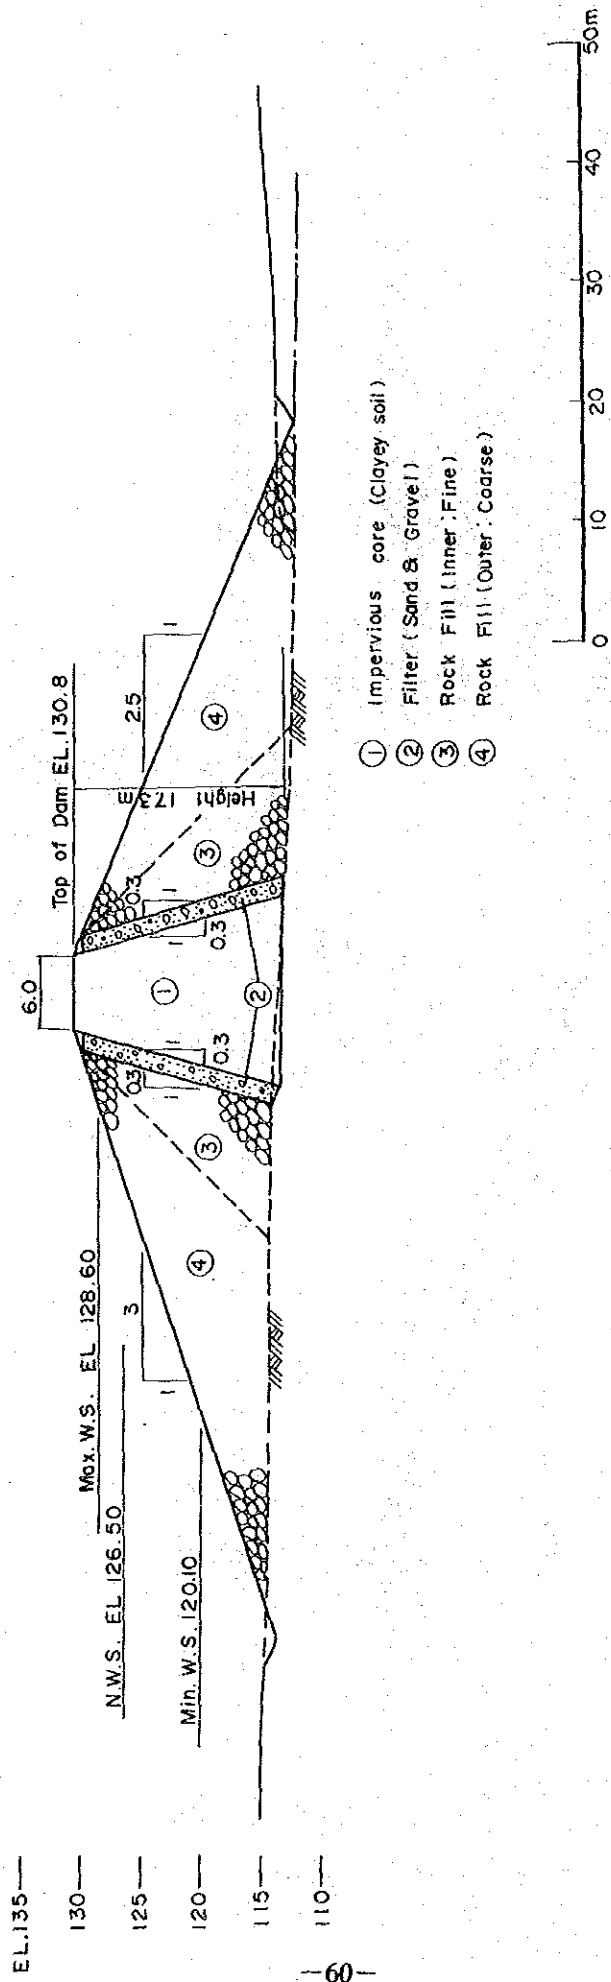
2. 3 TYPICAL SECTION OF PANGASAN DAM
